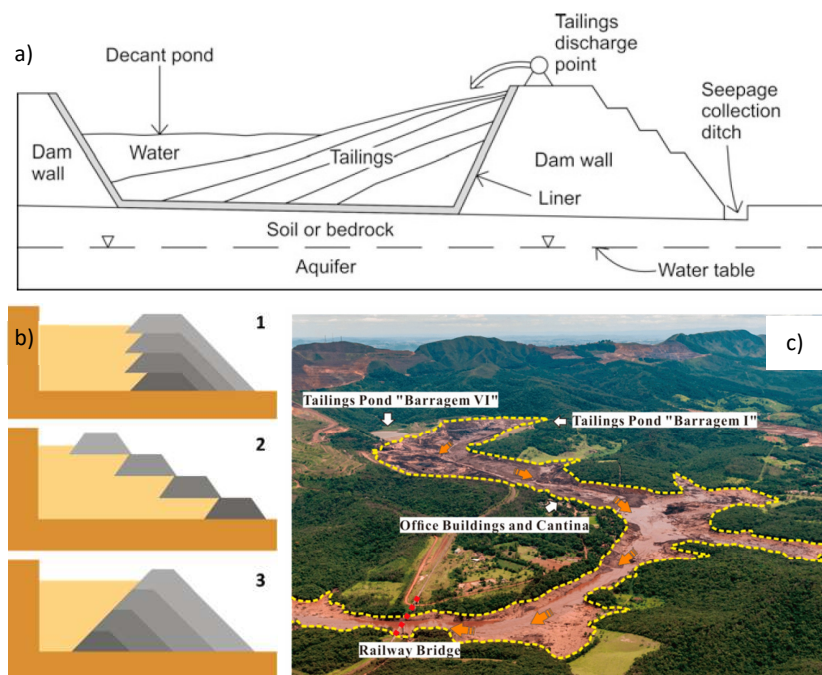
a) Simplified cross section of a tailings storage facility (TSF) for tailings waste, b) three common methods for TSF construction, and c) an example of a potential consequence of a TSF failure, Brumadinho, Brazil in 2019. Sources: (Cheng et al. 2021; Lottermoser 2010; Oberle, Brereton, and Mihaylova 2020; SGU 2024)
